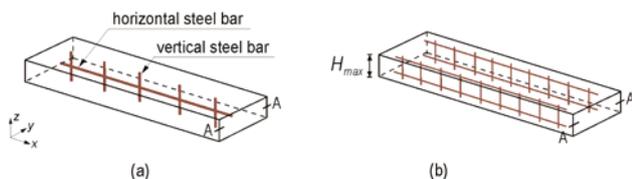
Three-dimensional view of the concrete wall model with reinforcement, where: A-A denotes the plane on which the field intensity distribution for the model was assessed: (a) 1p; (b) 2p
